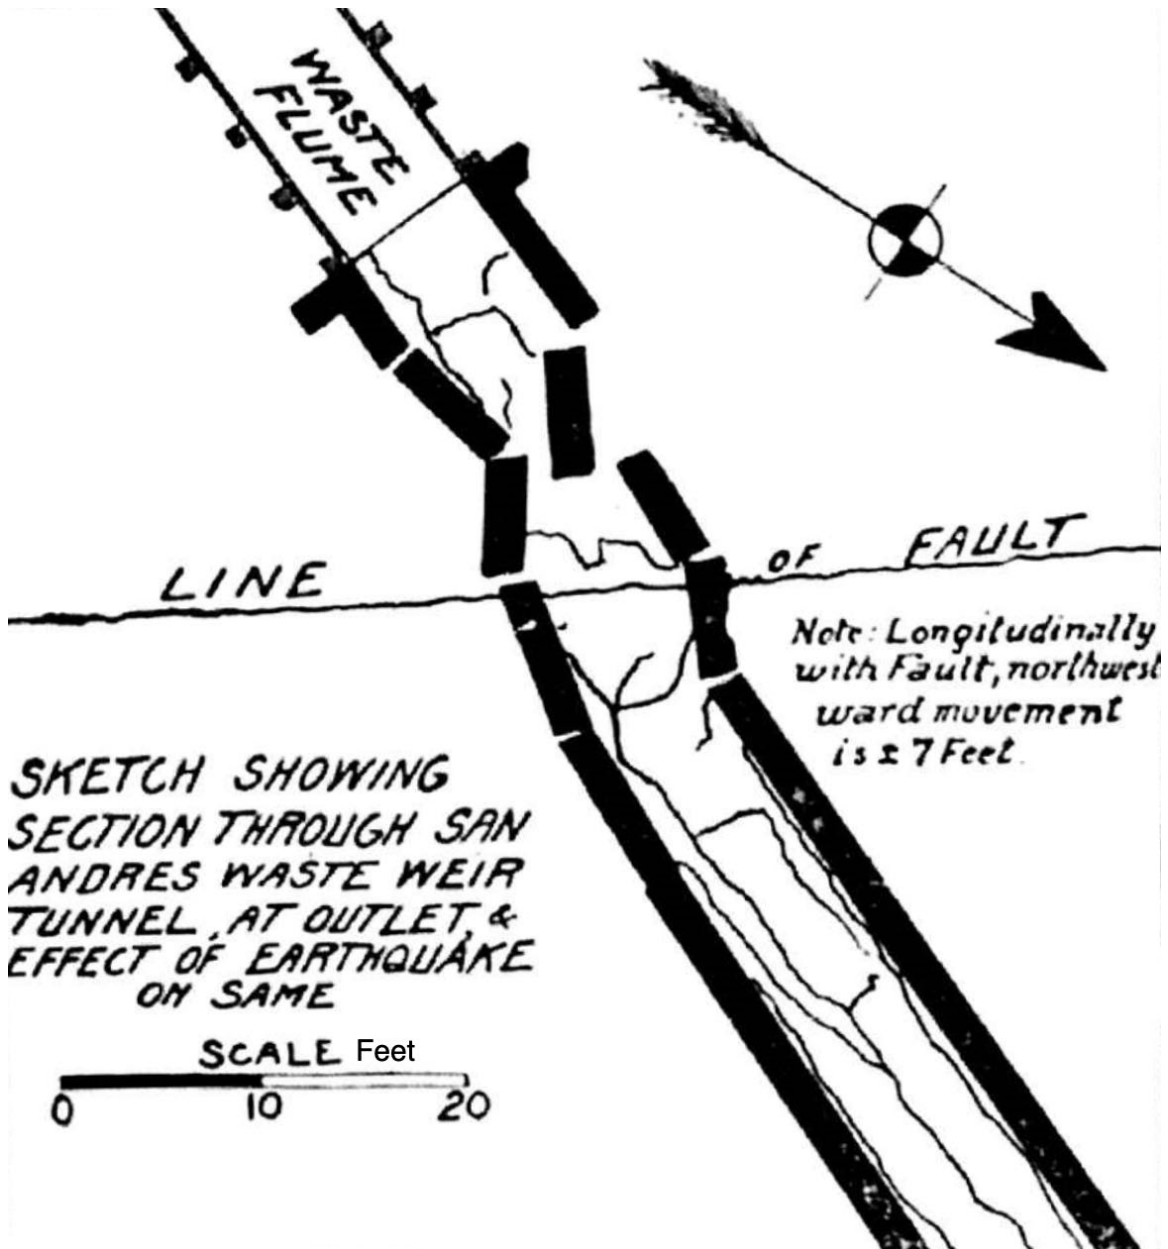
Line of Fault Through Wastewater Tunnel (Sketch: Schussler)
